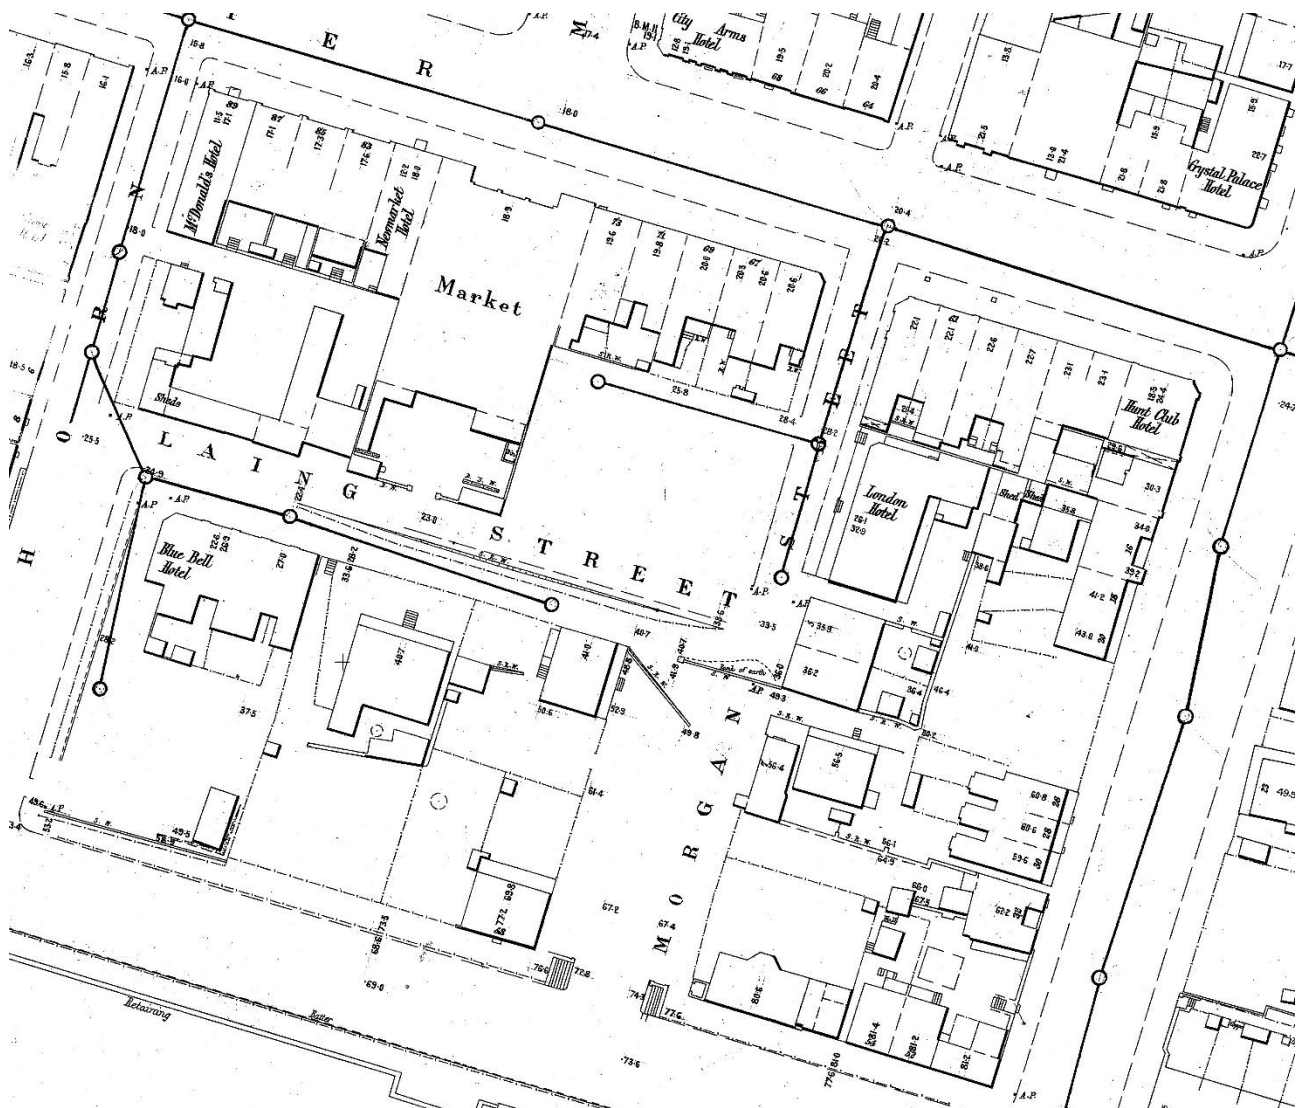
Detail of 1895-1896 Hunter District Water Board Plan Sheet 026
